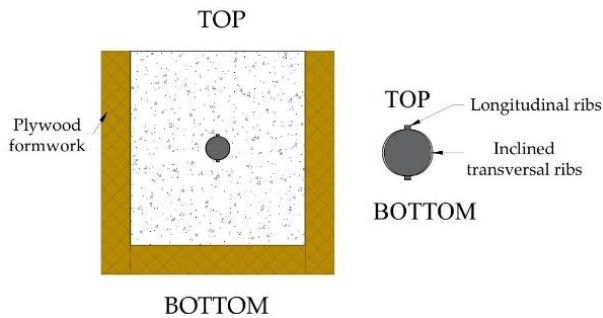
Cross-section of tension tie placed in plywood formwork
